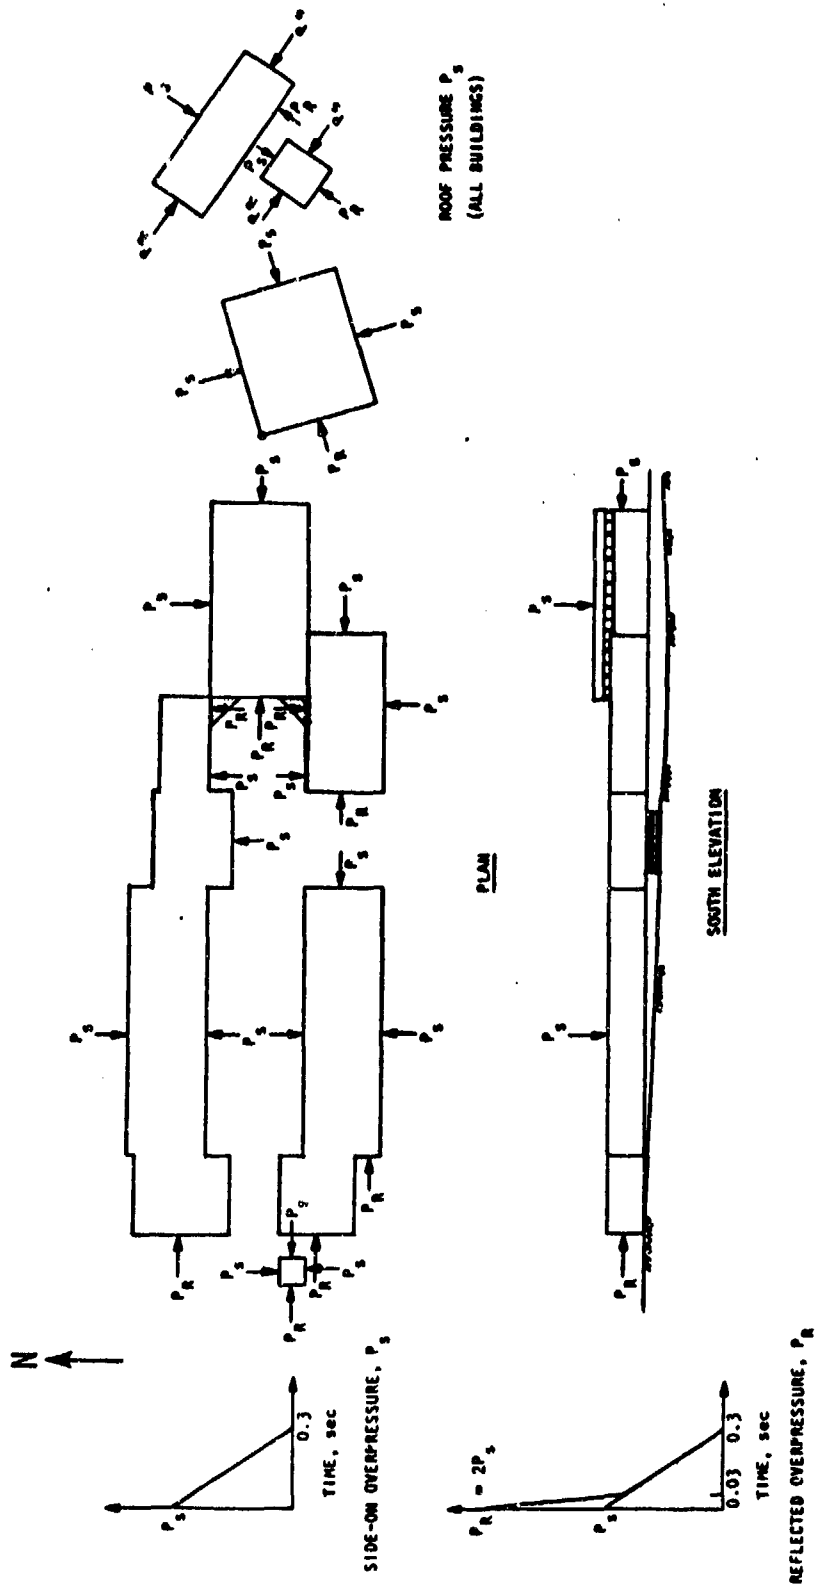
AIRBLAST LOADINGS ON SCHOOL AND ANCILLARY BUILDINGS
